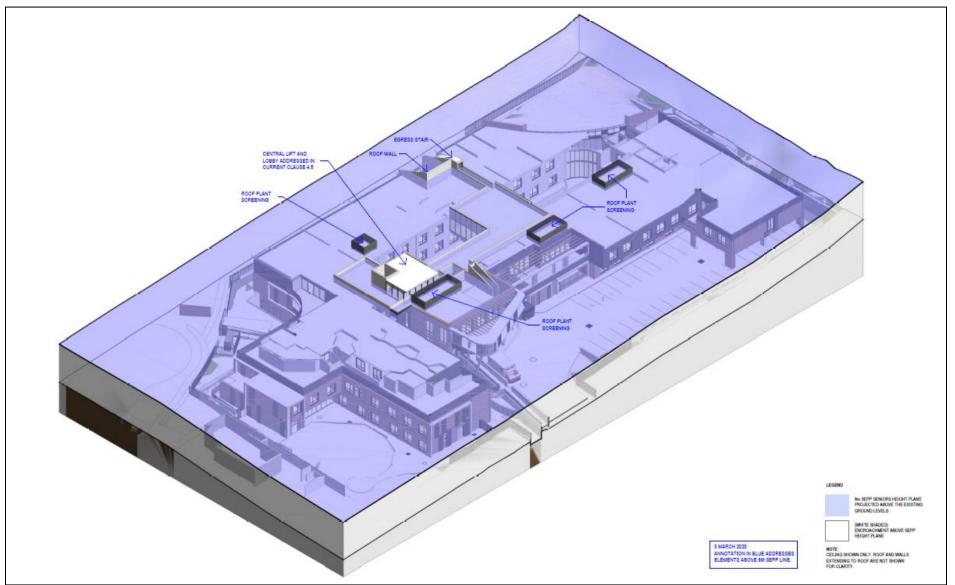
Building Height Plan for 8m Height Limity (Source: Jackson Teece Atchitects, 2020)
